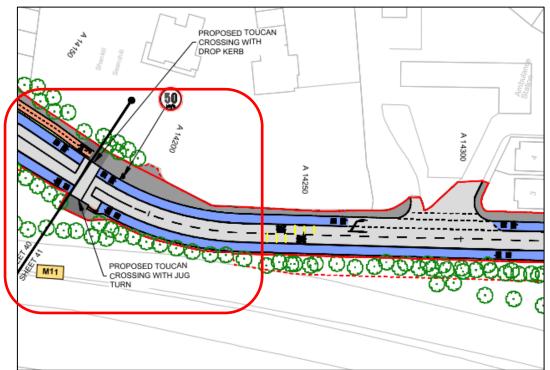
Extract from General Arrangement Drawing at Loughlinstown Roundabout (Sheet 41)
